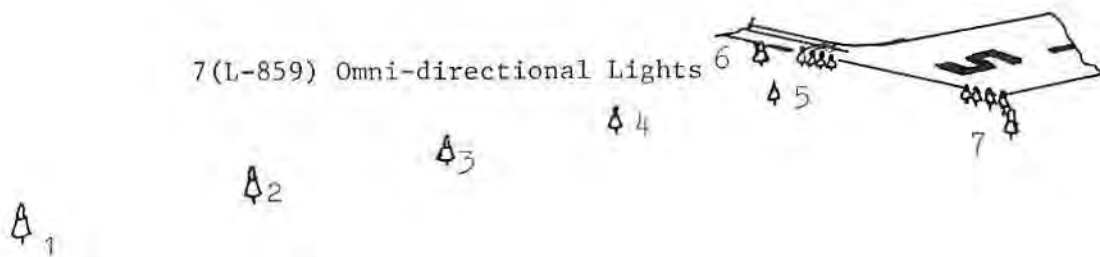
TYPICAL ODALS INSTALLATION
